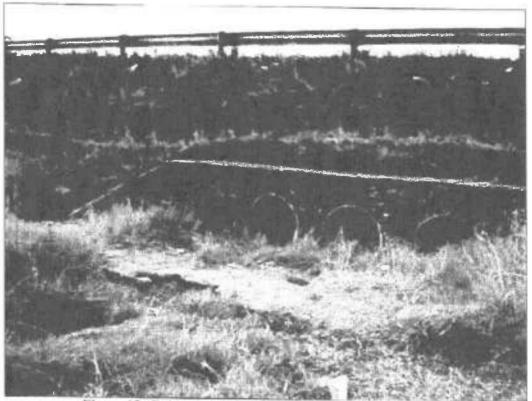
Culverts at cross section 760 (River reach A2-4.1)
